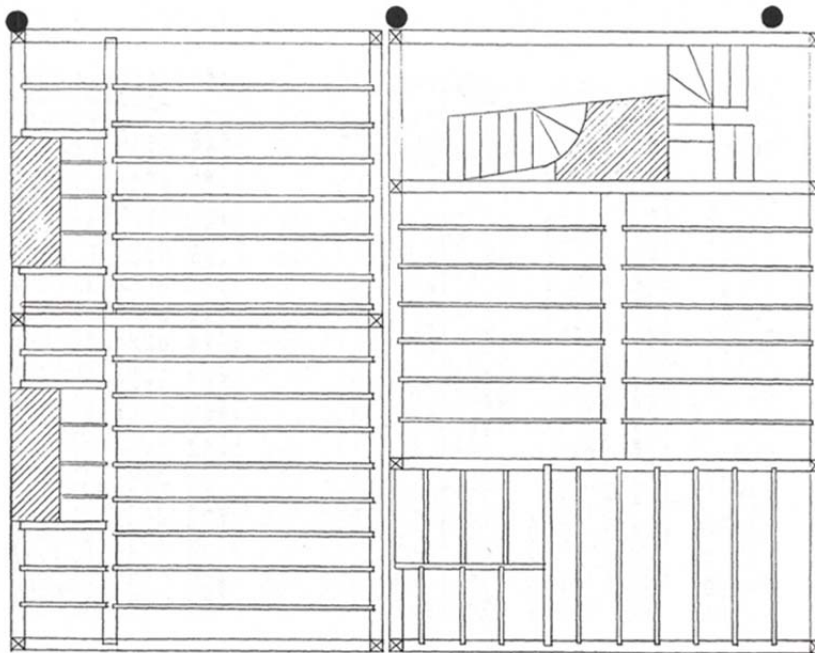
Antram-Gray House: Second-Floor Framing Plan. Scale 1/4" = 1'-0"
